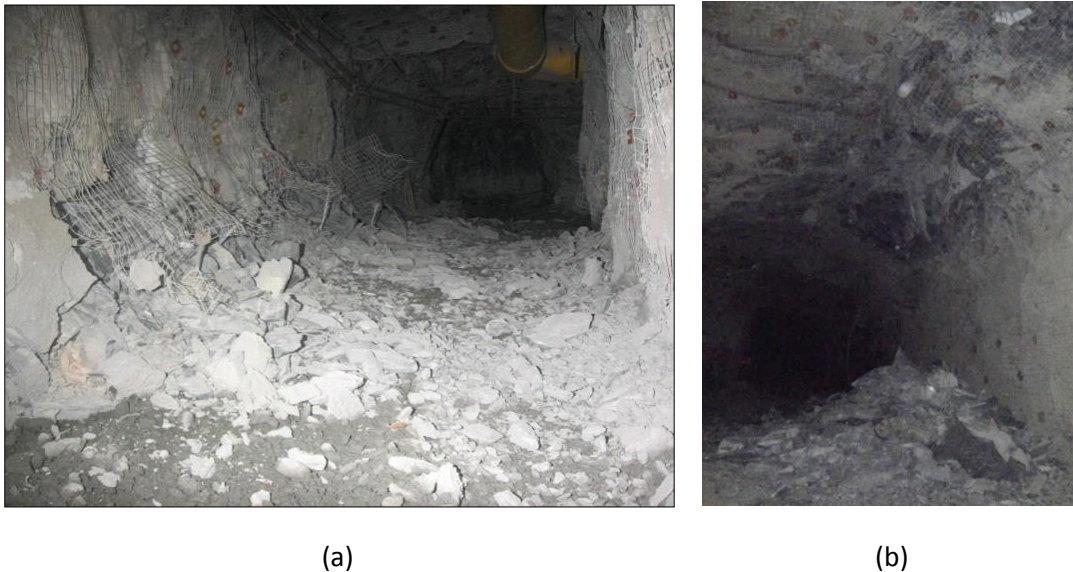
Typical wall and back damage at LaRonde Mine; (a) typical wall damage; (b) typical back damage
